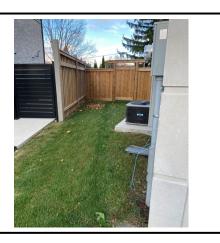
Photo shows the entrance to the rear yard/backyard where a proposed cabana (accessory structure) is to be facilitated.
